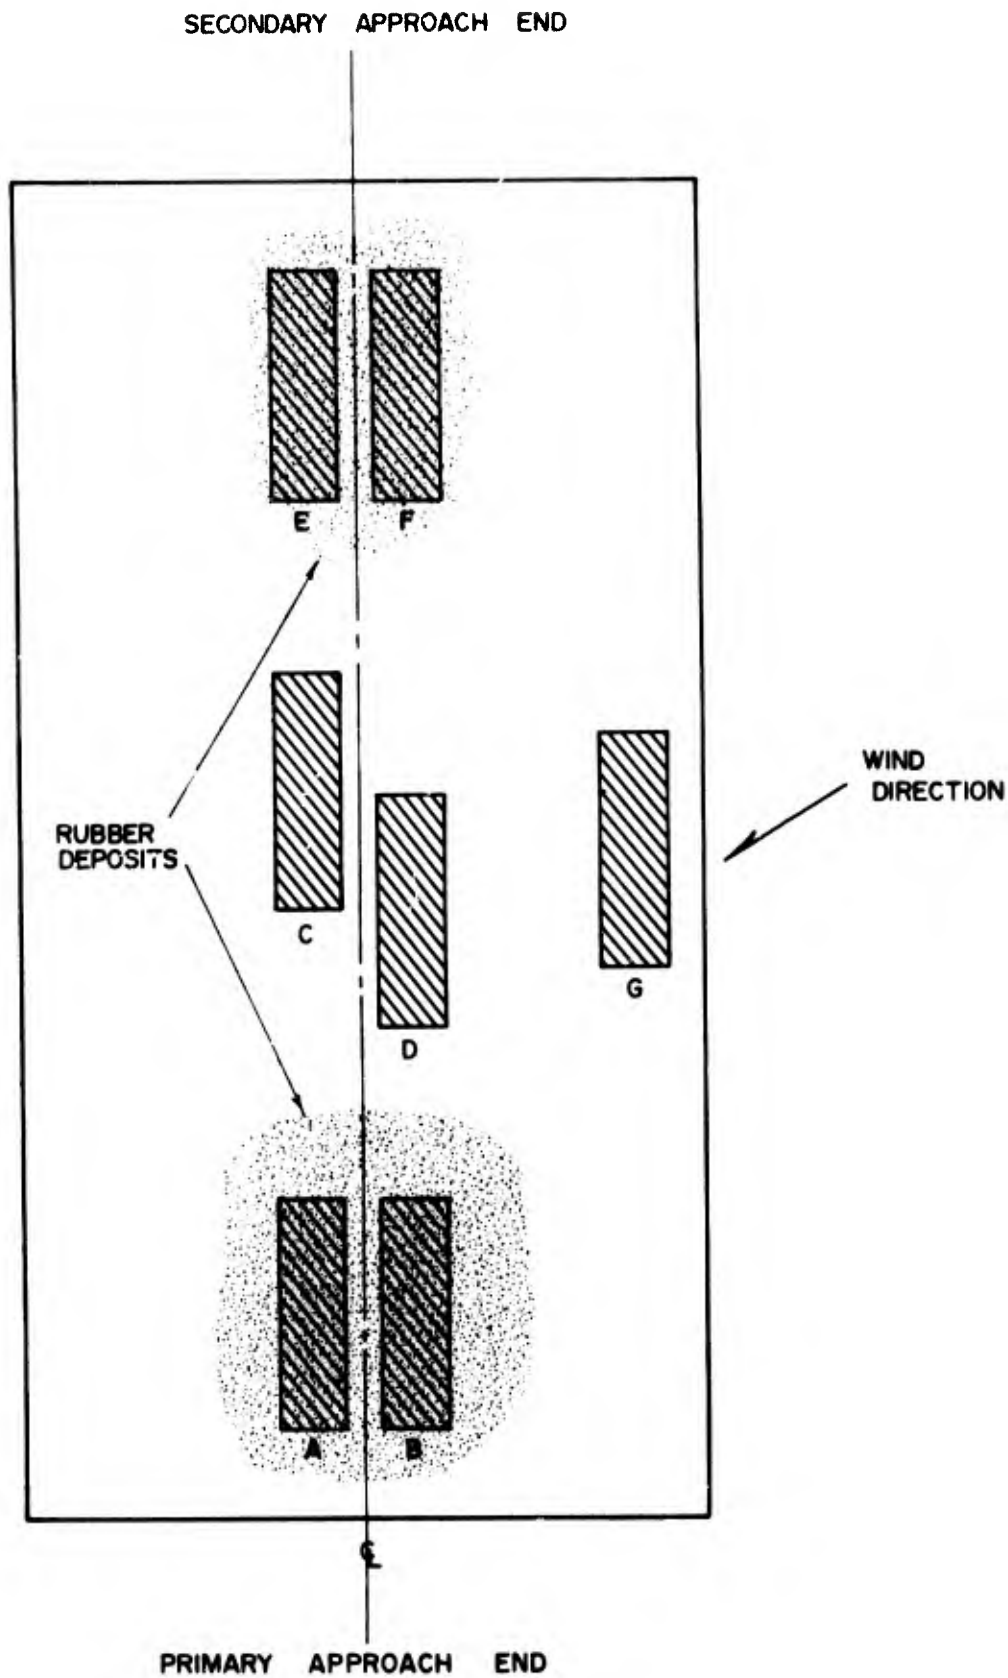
TYPICAL LAYOUT OF TEST SECTIONS.
